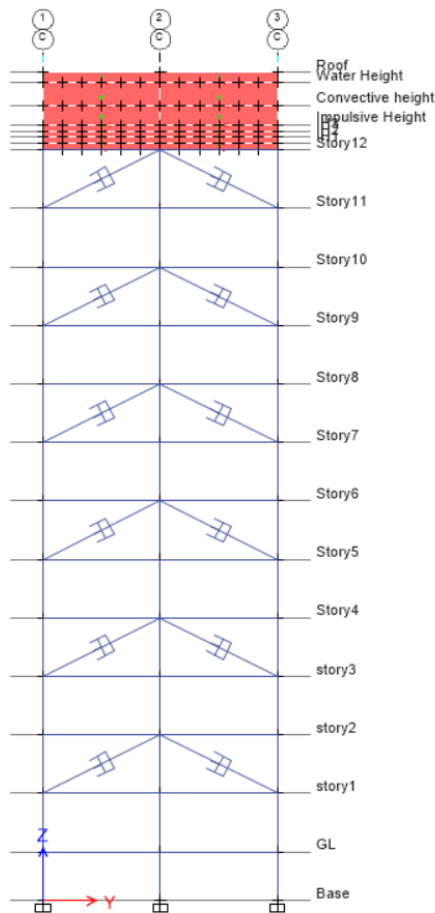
Elevation of 12 Staging Elevated water tank with FVD
